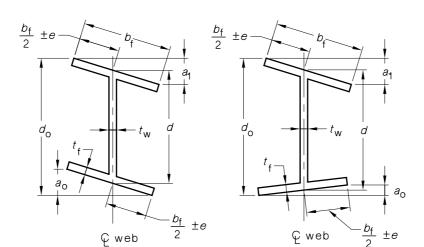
(1) TOLERANCES ON A CROSS-SECTION
